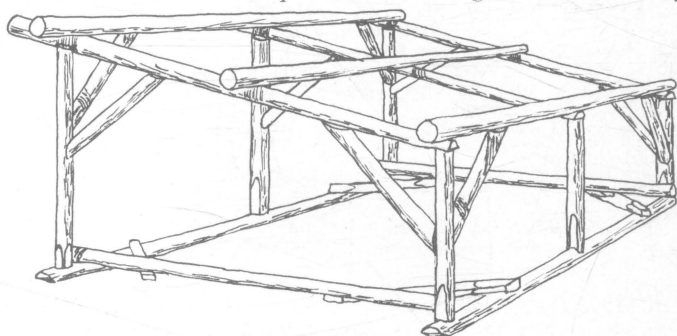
Pole frame for construction of shed roof shelter. Plan No. 02651.
